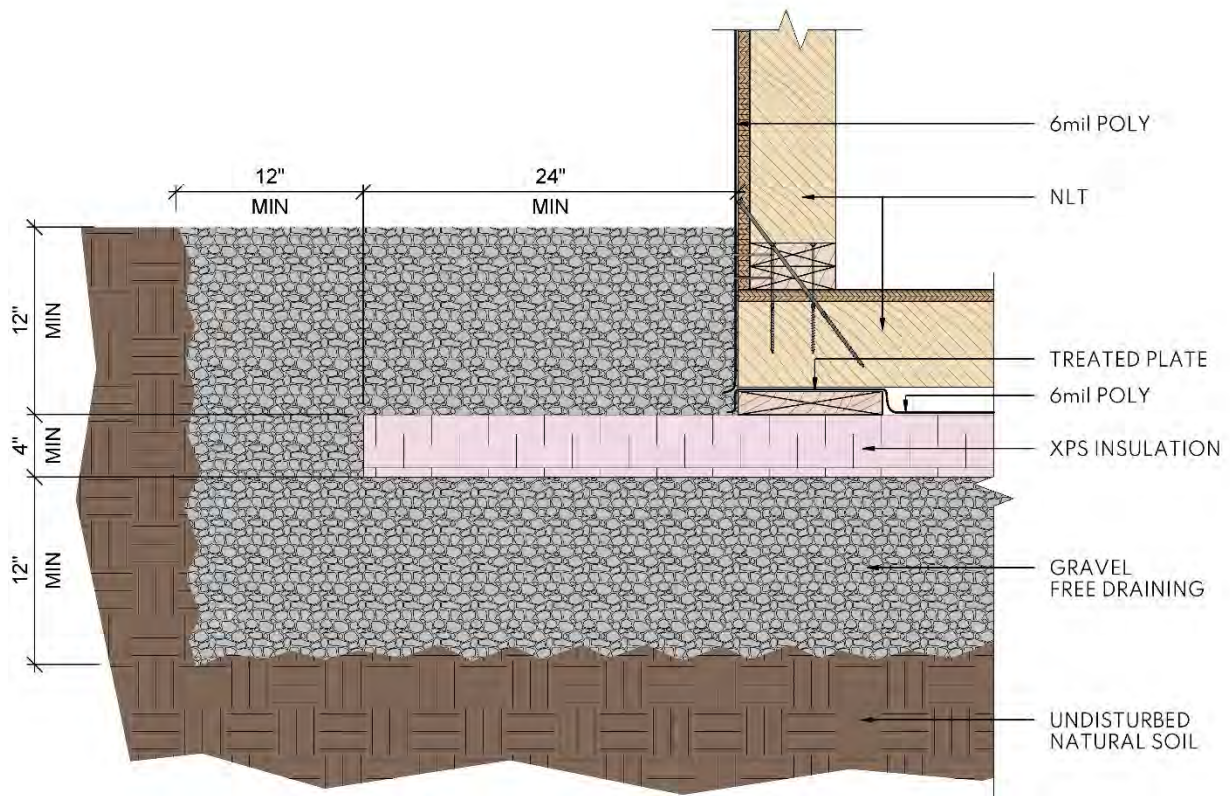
MT NLT Slab and wall edge of building detail for Slab on Grade (SOG) Buildings.
